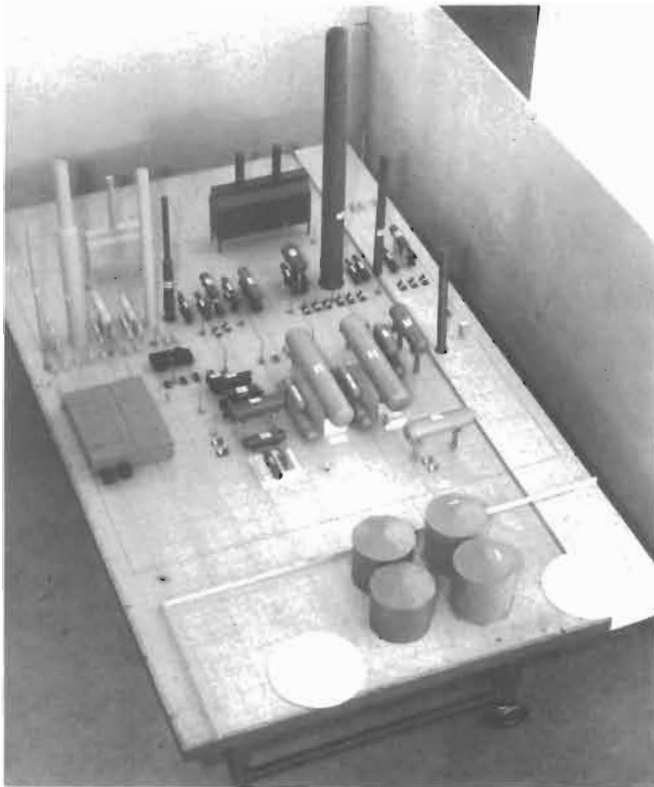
A. Simple block model plant layout. Courtesy of Socony Mobil Oil Co. Inc.
